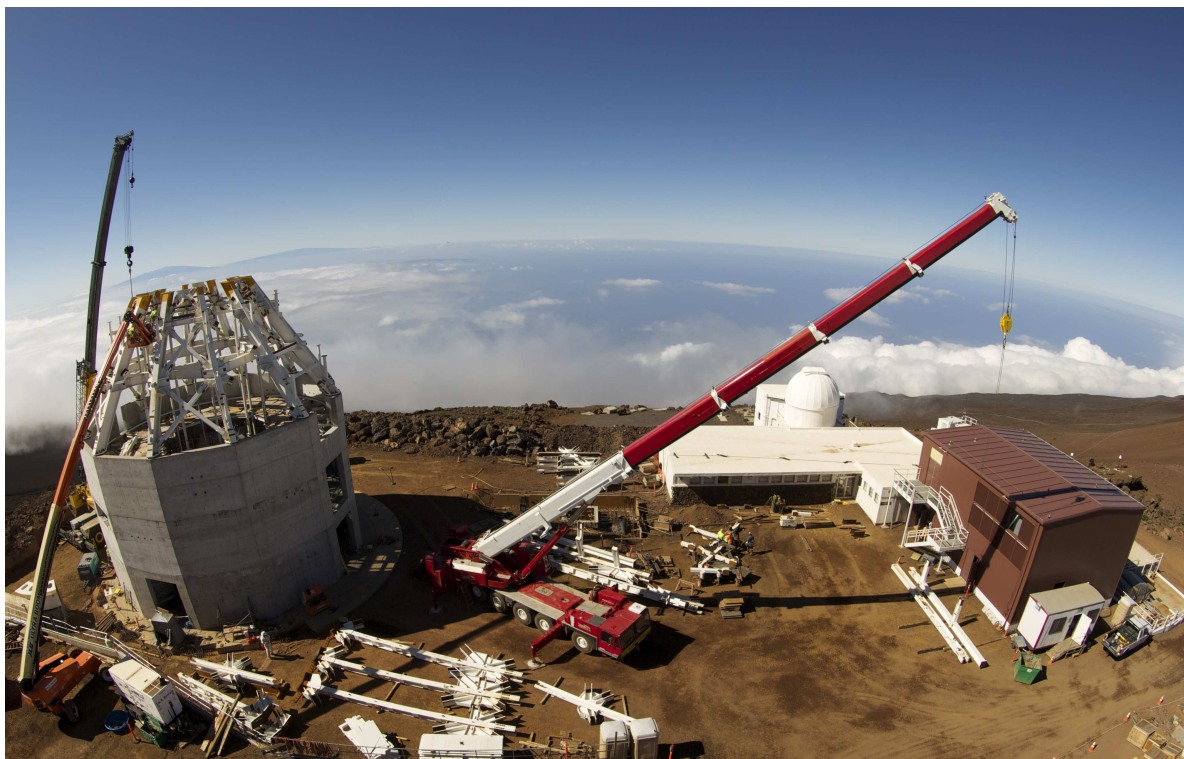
Construction site on Haleakalā, Maui, 21 May 2014. Left: Inner concrete telescope pier. Middle: Mees Observatory (white building). Right: Utility building
